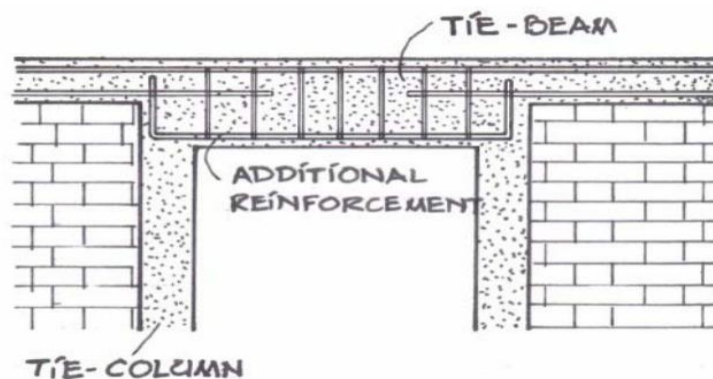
Lintel beam reinforcement (*Yamin et al, 2011*)
